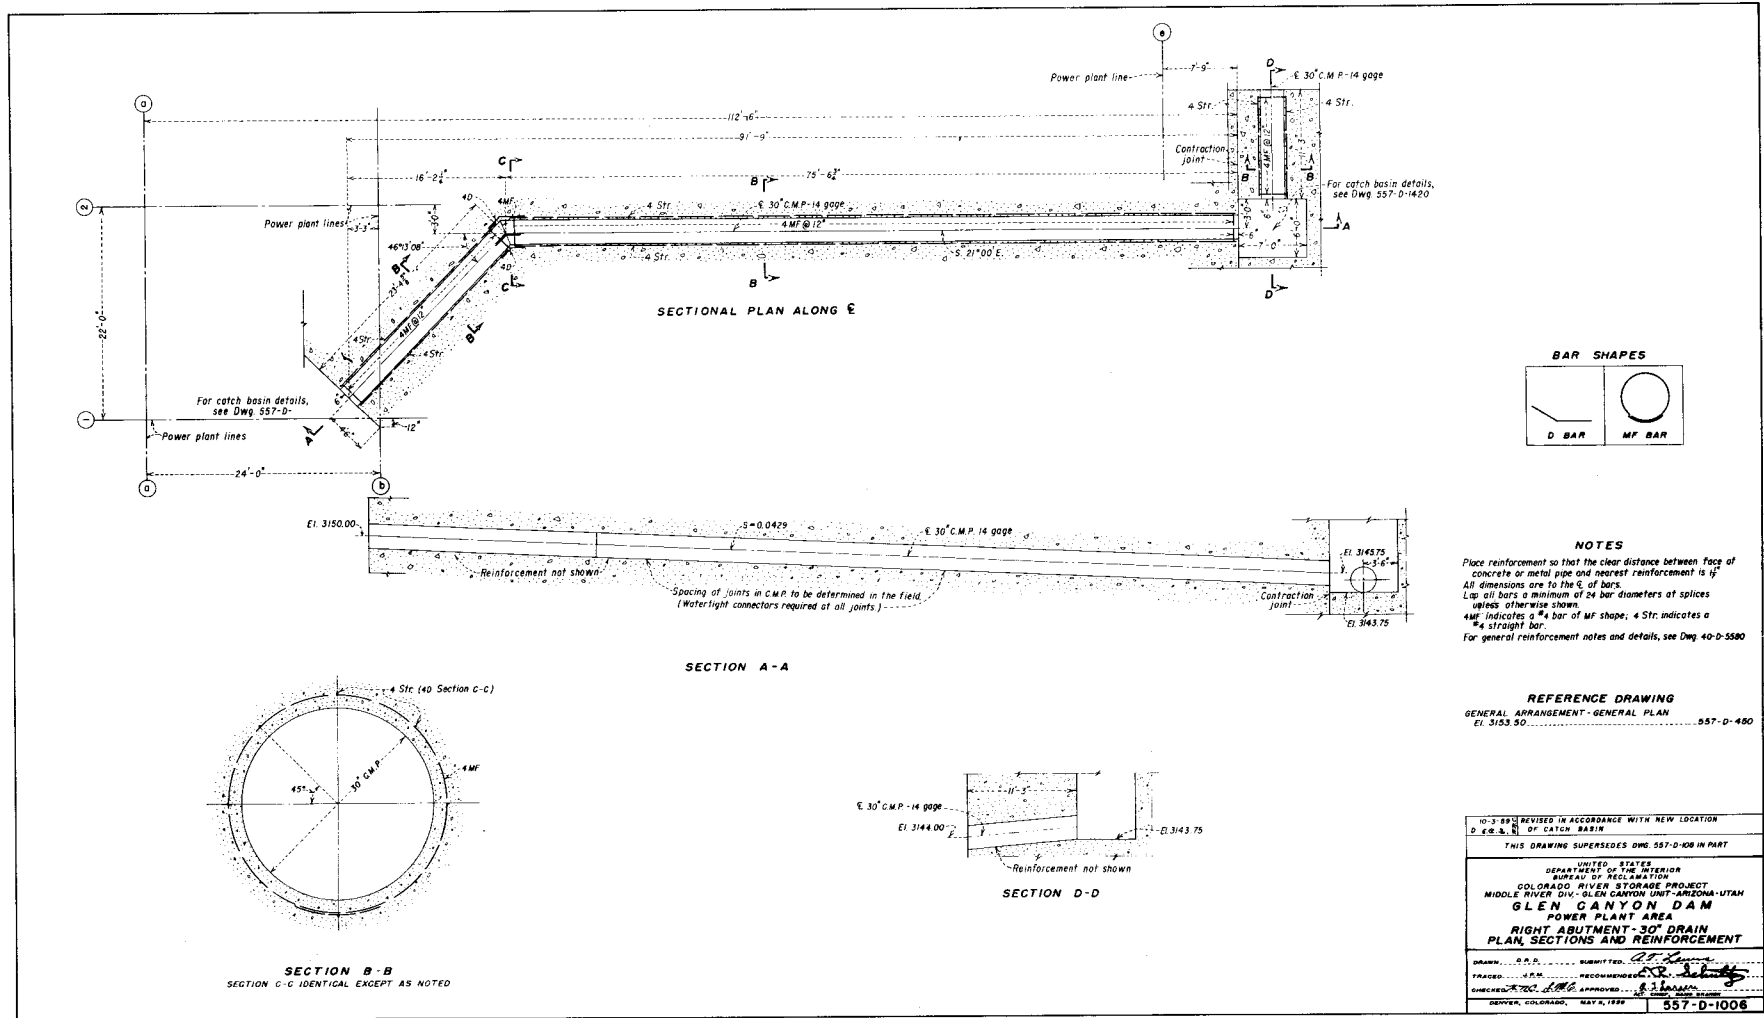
Right abutment 30-inch drain in dam powerplant area—Plan, sections, and reinforcement.
